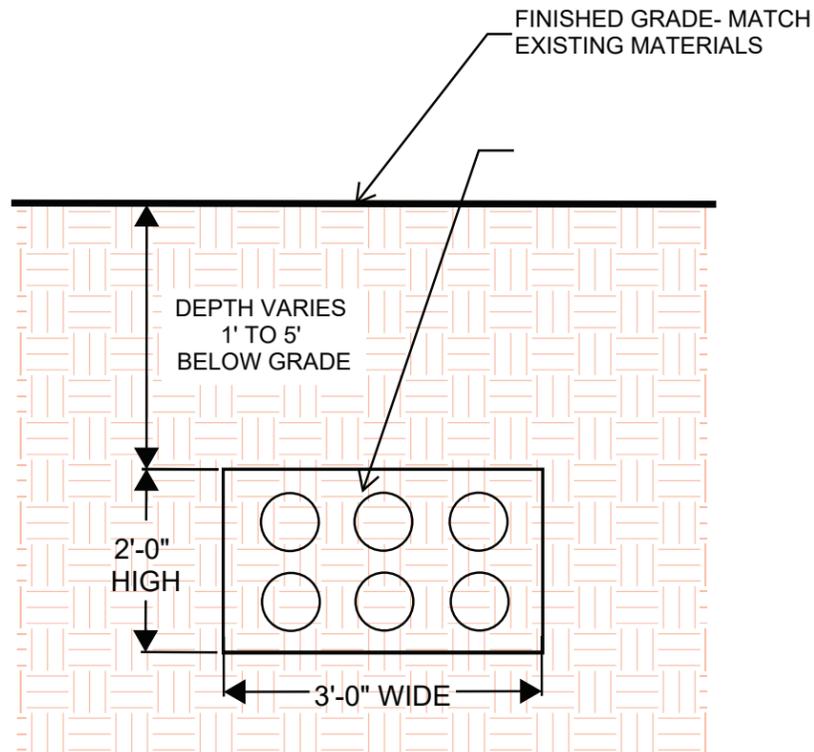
b - Detail section. Proposed new telecom ductbank.
